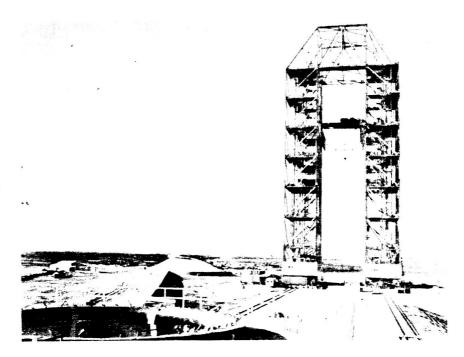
FACILITIES CONSTRUCTION AT LAUNCH COMPLEX 34
